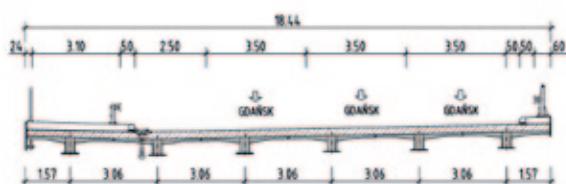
, Carriageway in direction Gdansk of bridge MD-1 with six VFT-WIB girders in the cross section
